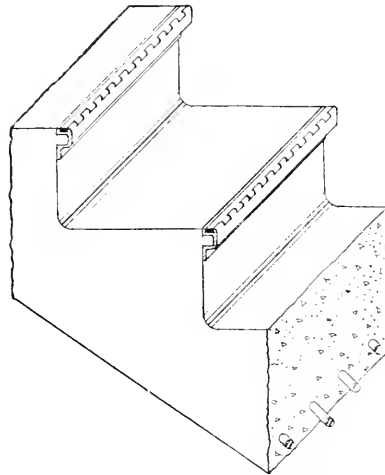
ABRASIVE SAFETY NOSING FOR CONCRETE STAIRS
